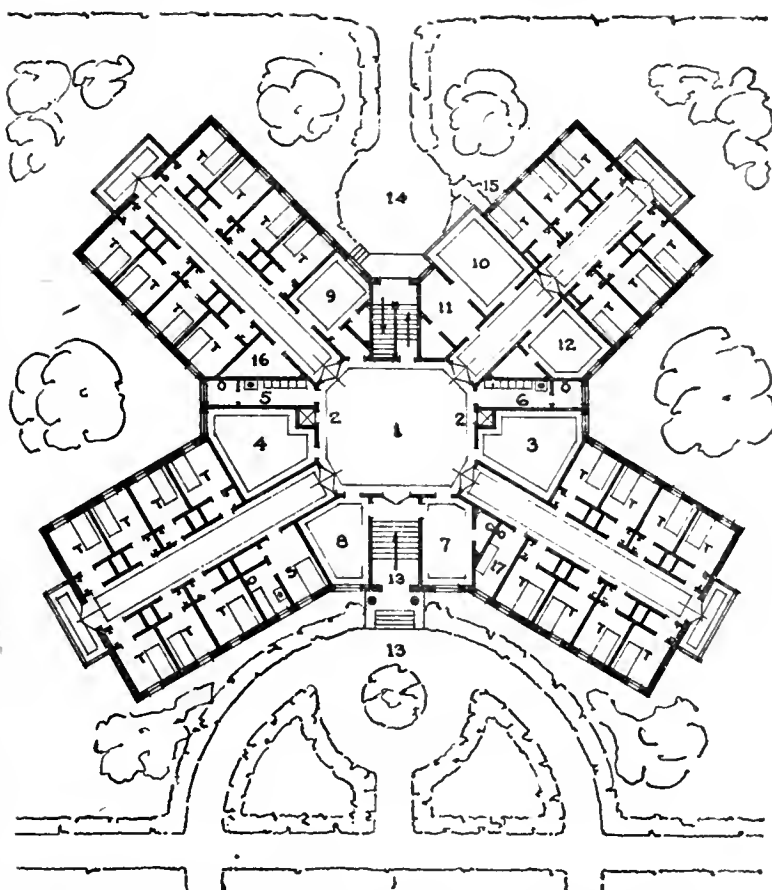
First floor plan of thirty bed hospital: 1, general rotunda, from the center of which a view of every door is secured; 2, service dumbwaiters from basement; 3, chart room, library and depository for histories; 4, laboratory and drug room; 5, men's toilet and locker room; 6, women's toilet and locker room; 7, general waiting room; 8, office of superintendent; 9, examining room and emergency operating room; 10, major operating room; 11, sterilizing and instrument room; 12, roentgen-ray room and dark room; 13, main entrance; 14, rear and ambulance entrance; 15, storage, chairs, carts, etc.; 16, special room with bath; 17, special bath; 18, typical room; 19, special room with bath.
